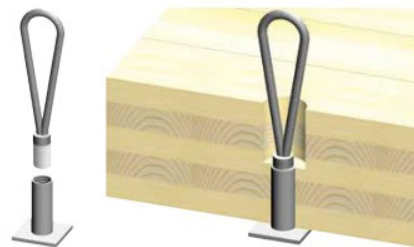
a) Single lifting loop with threaded sleeve used with socket steel tube welded onto a flat plate.
